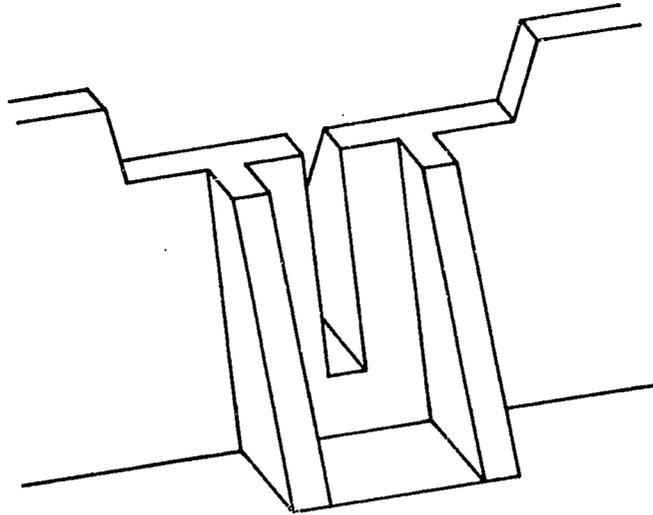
Schematic diagram of buttress wall downstream from a runoff detention dam
